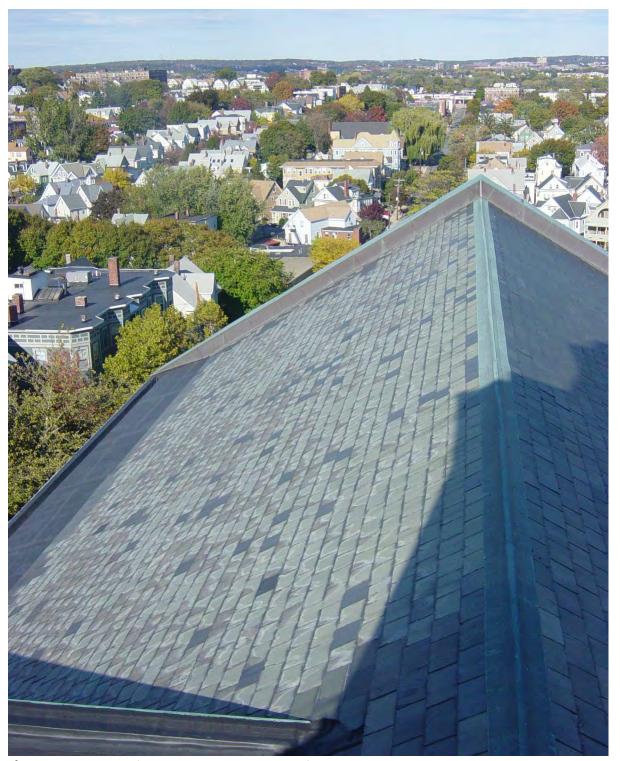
Slate roofs are in good condition. A few cracked and missing slates were seen. Built-in EPDM lined gutters appear in good condition. The copper ridge appears to be in good condition.
